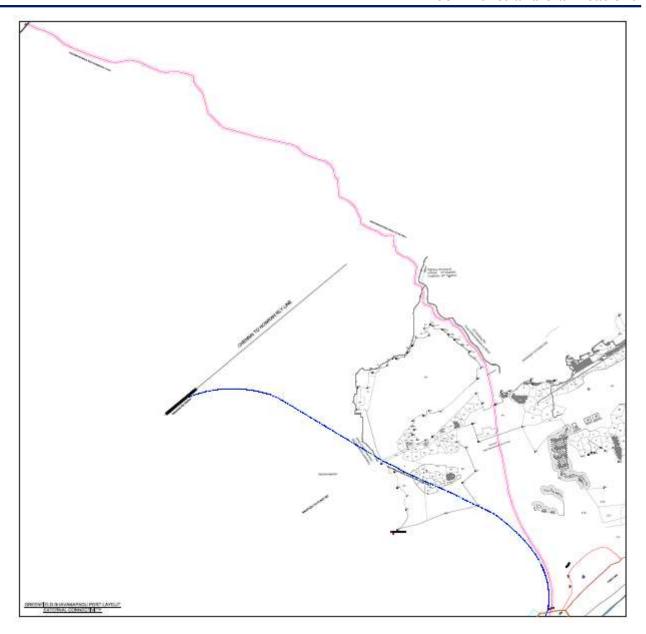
The Greenfield Bhavanapadu Port External Connectivity Layout
